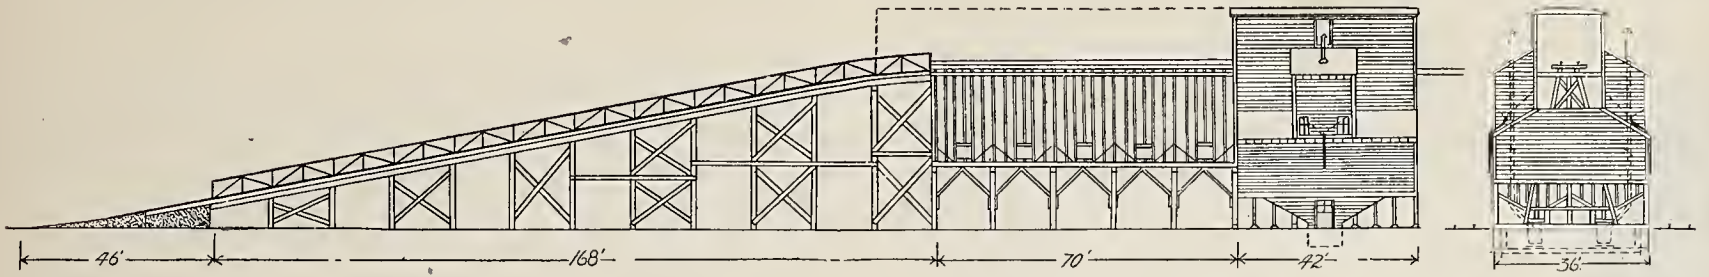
ELEVATION AND SECTION OF T. R. R. A. OF ST. L. SAND HOUSE.
